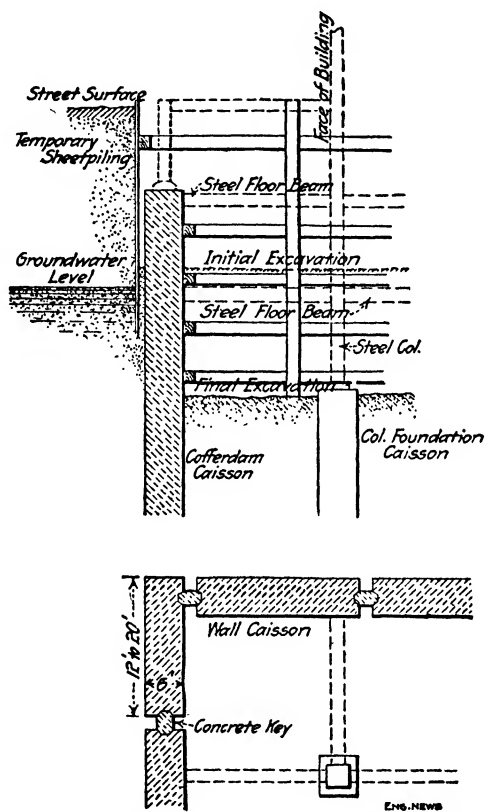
Connection and Bracing of Wall Caissons.
